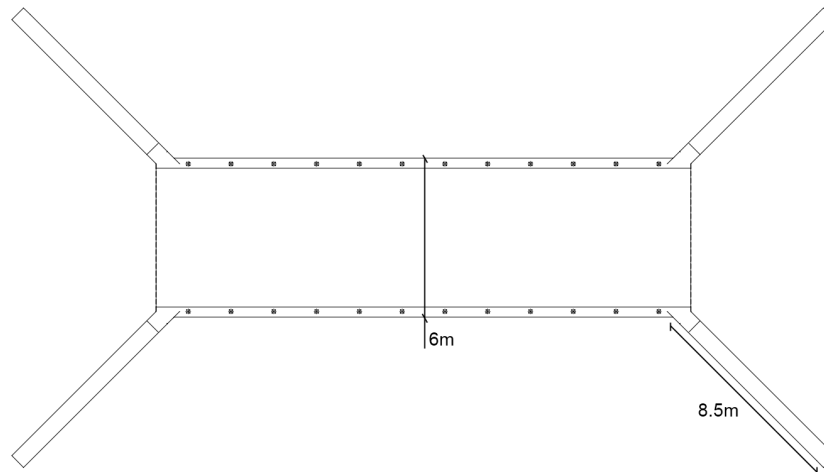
Floor plan of bridge 829 in Katrineholm
